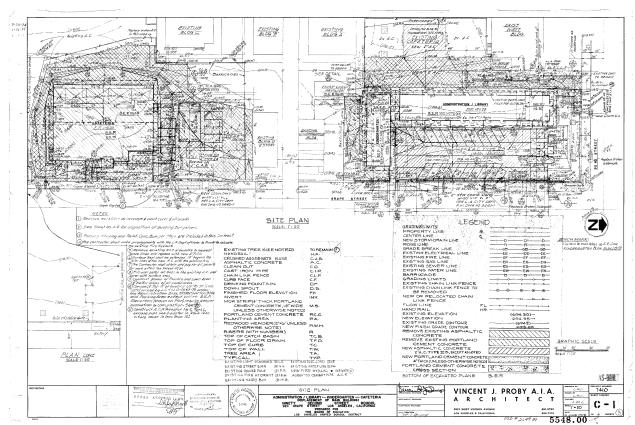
Architectural Plan of Administrative & Library Building/Kindergarten Building and Cafeteria Building SOURCE: LAUSD Vault Drawing No. 5548.00.000 [015]
